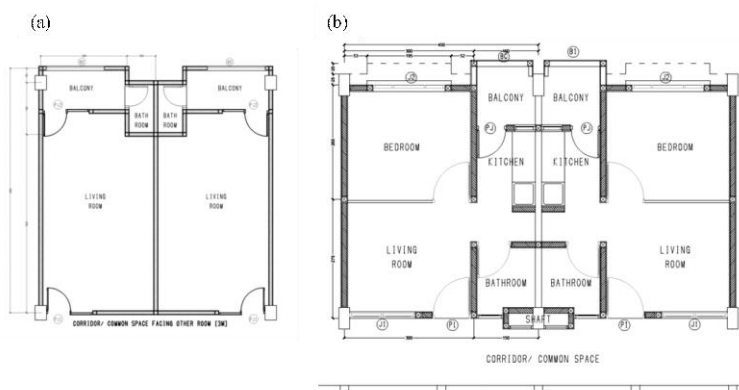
Typical floor plan of unit in (a) old public apartment and (b) new public apartment.
